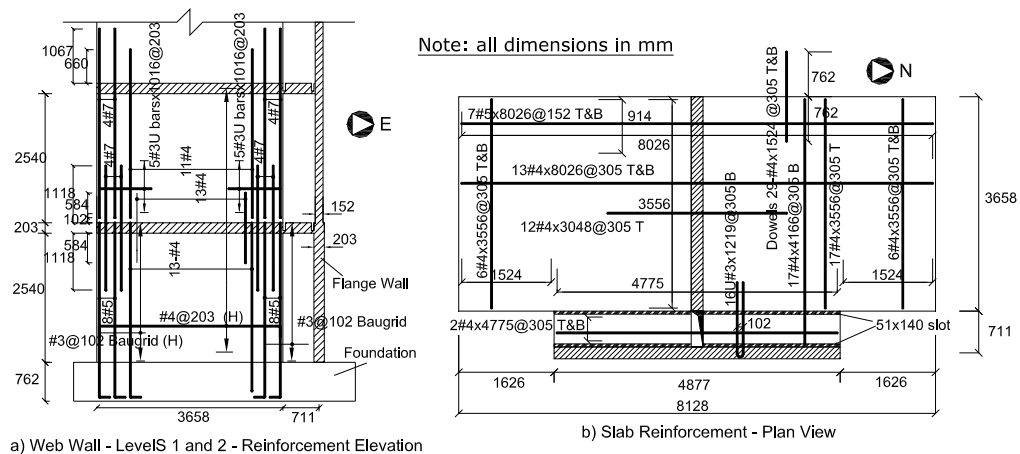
Web Wall Levels 1&2 and Slab Reinforcement
